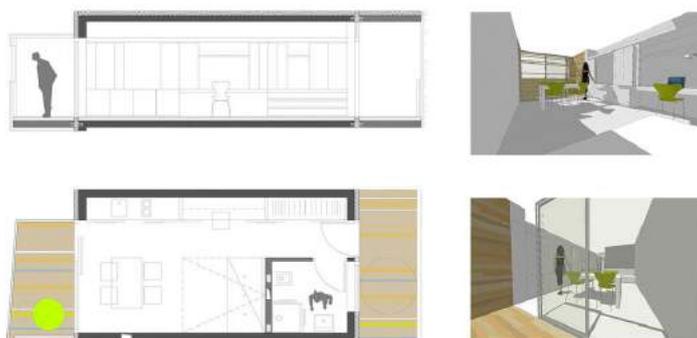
Residential units, plan, facade, perspective (Paris, France, OFIS architects, 2008)
